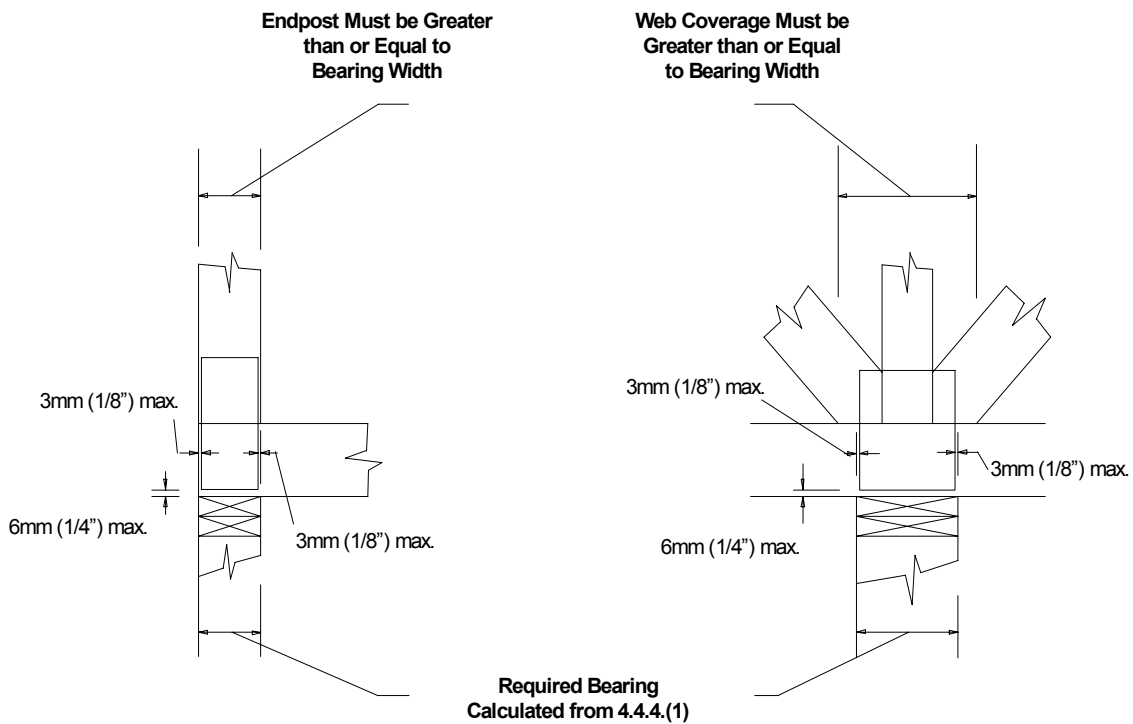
Bearing Reinforcement With Connector Plates
